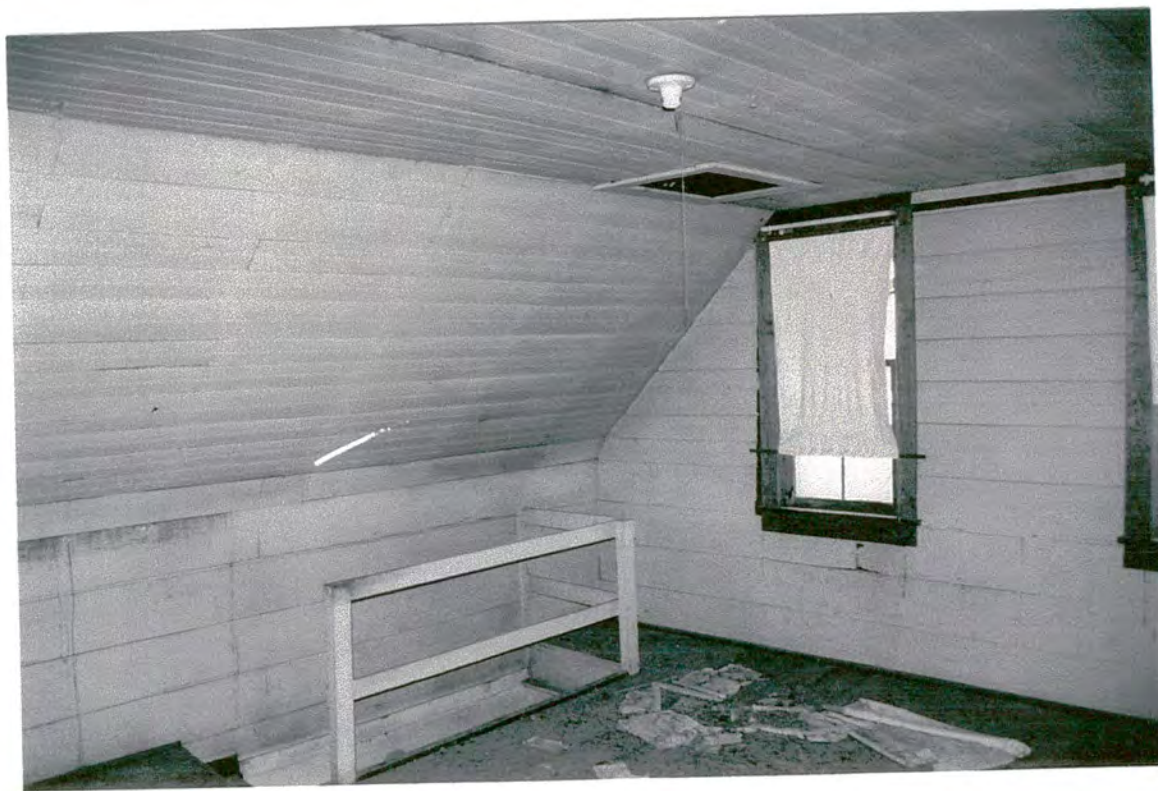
Pritchard House – north loft room with stair opening at left, looking northwest
